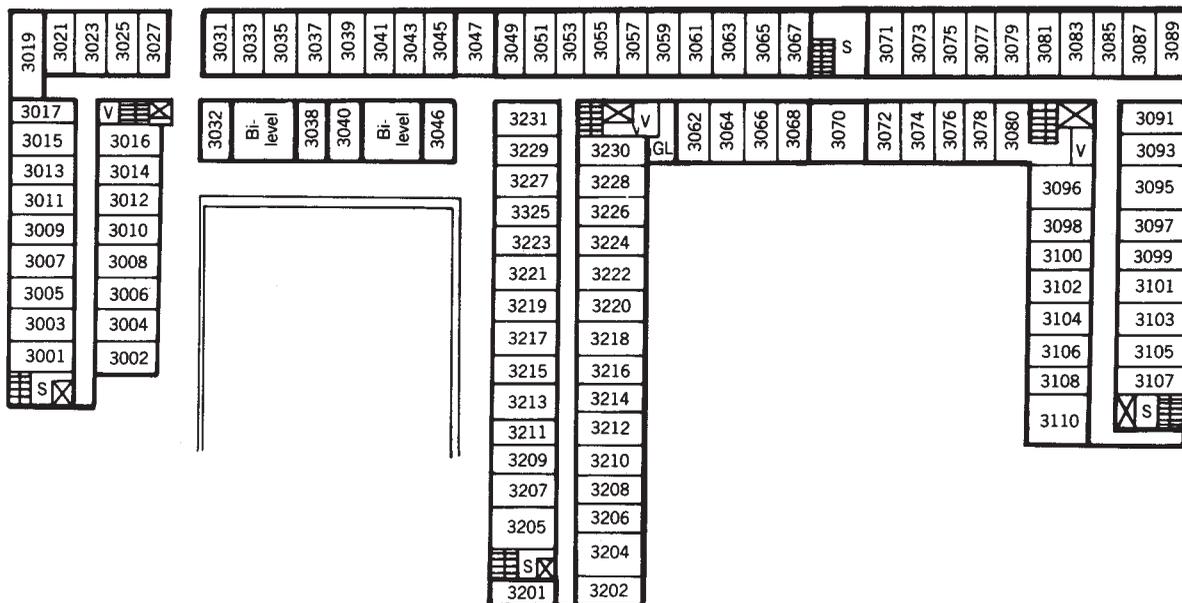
Floor plan layout of the model hotel; 112 third-floor rooms.
